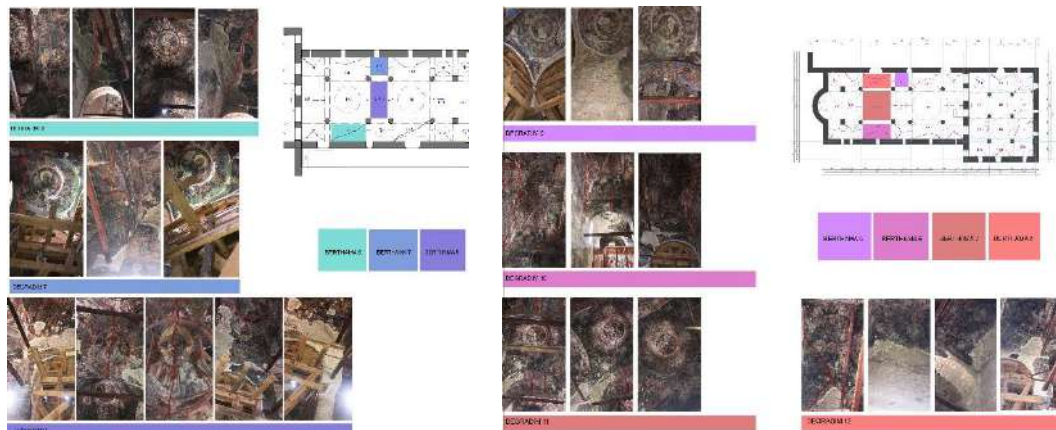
Interior images of temporary wooden reinforcement of arches [1]
